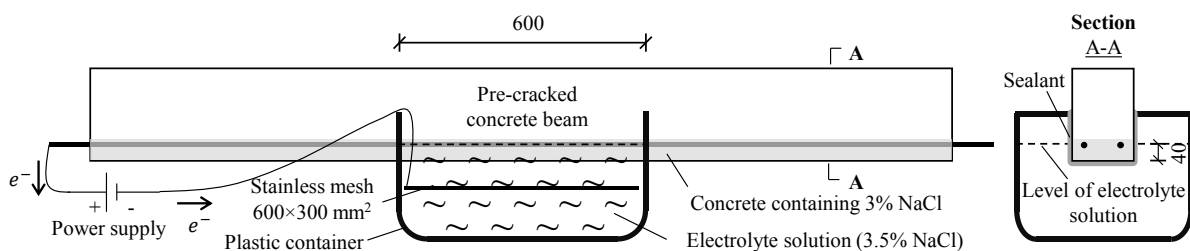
Electrical circuit set-up for the accelerated corrosion of pre-cracked concrete beams and side view of the beam in the plastic container.
